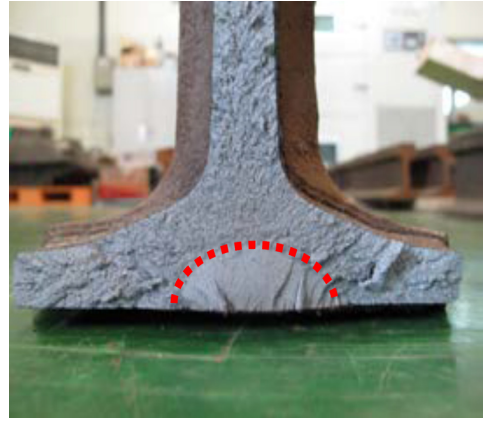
Fracture surface of a fatigue crack in thermite weld^[10]
